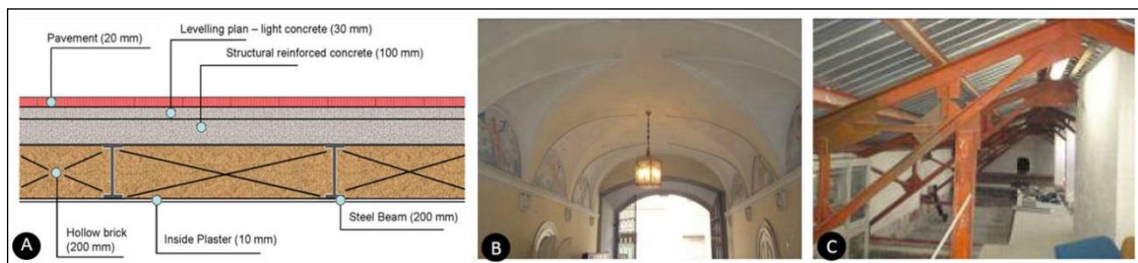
a) Schematic draw of the floor; b) Vaults of the closed court at the ground floor; c) Steel truss on the roof
